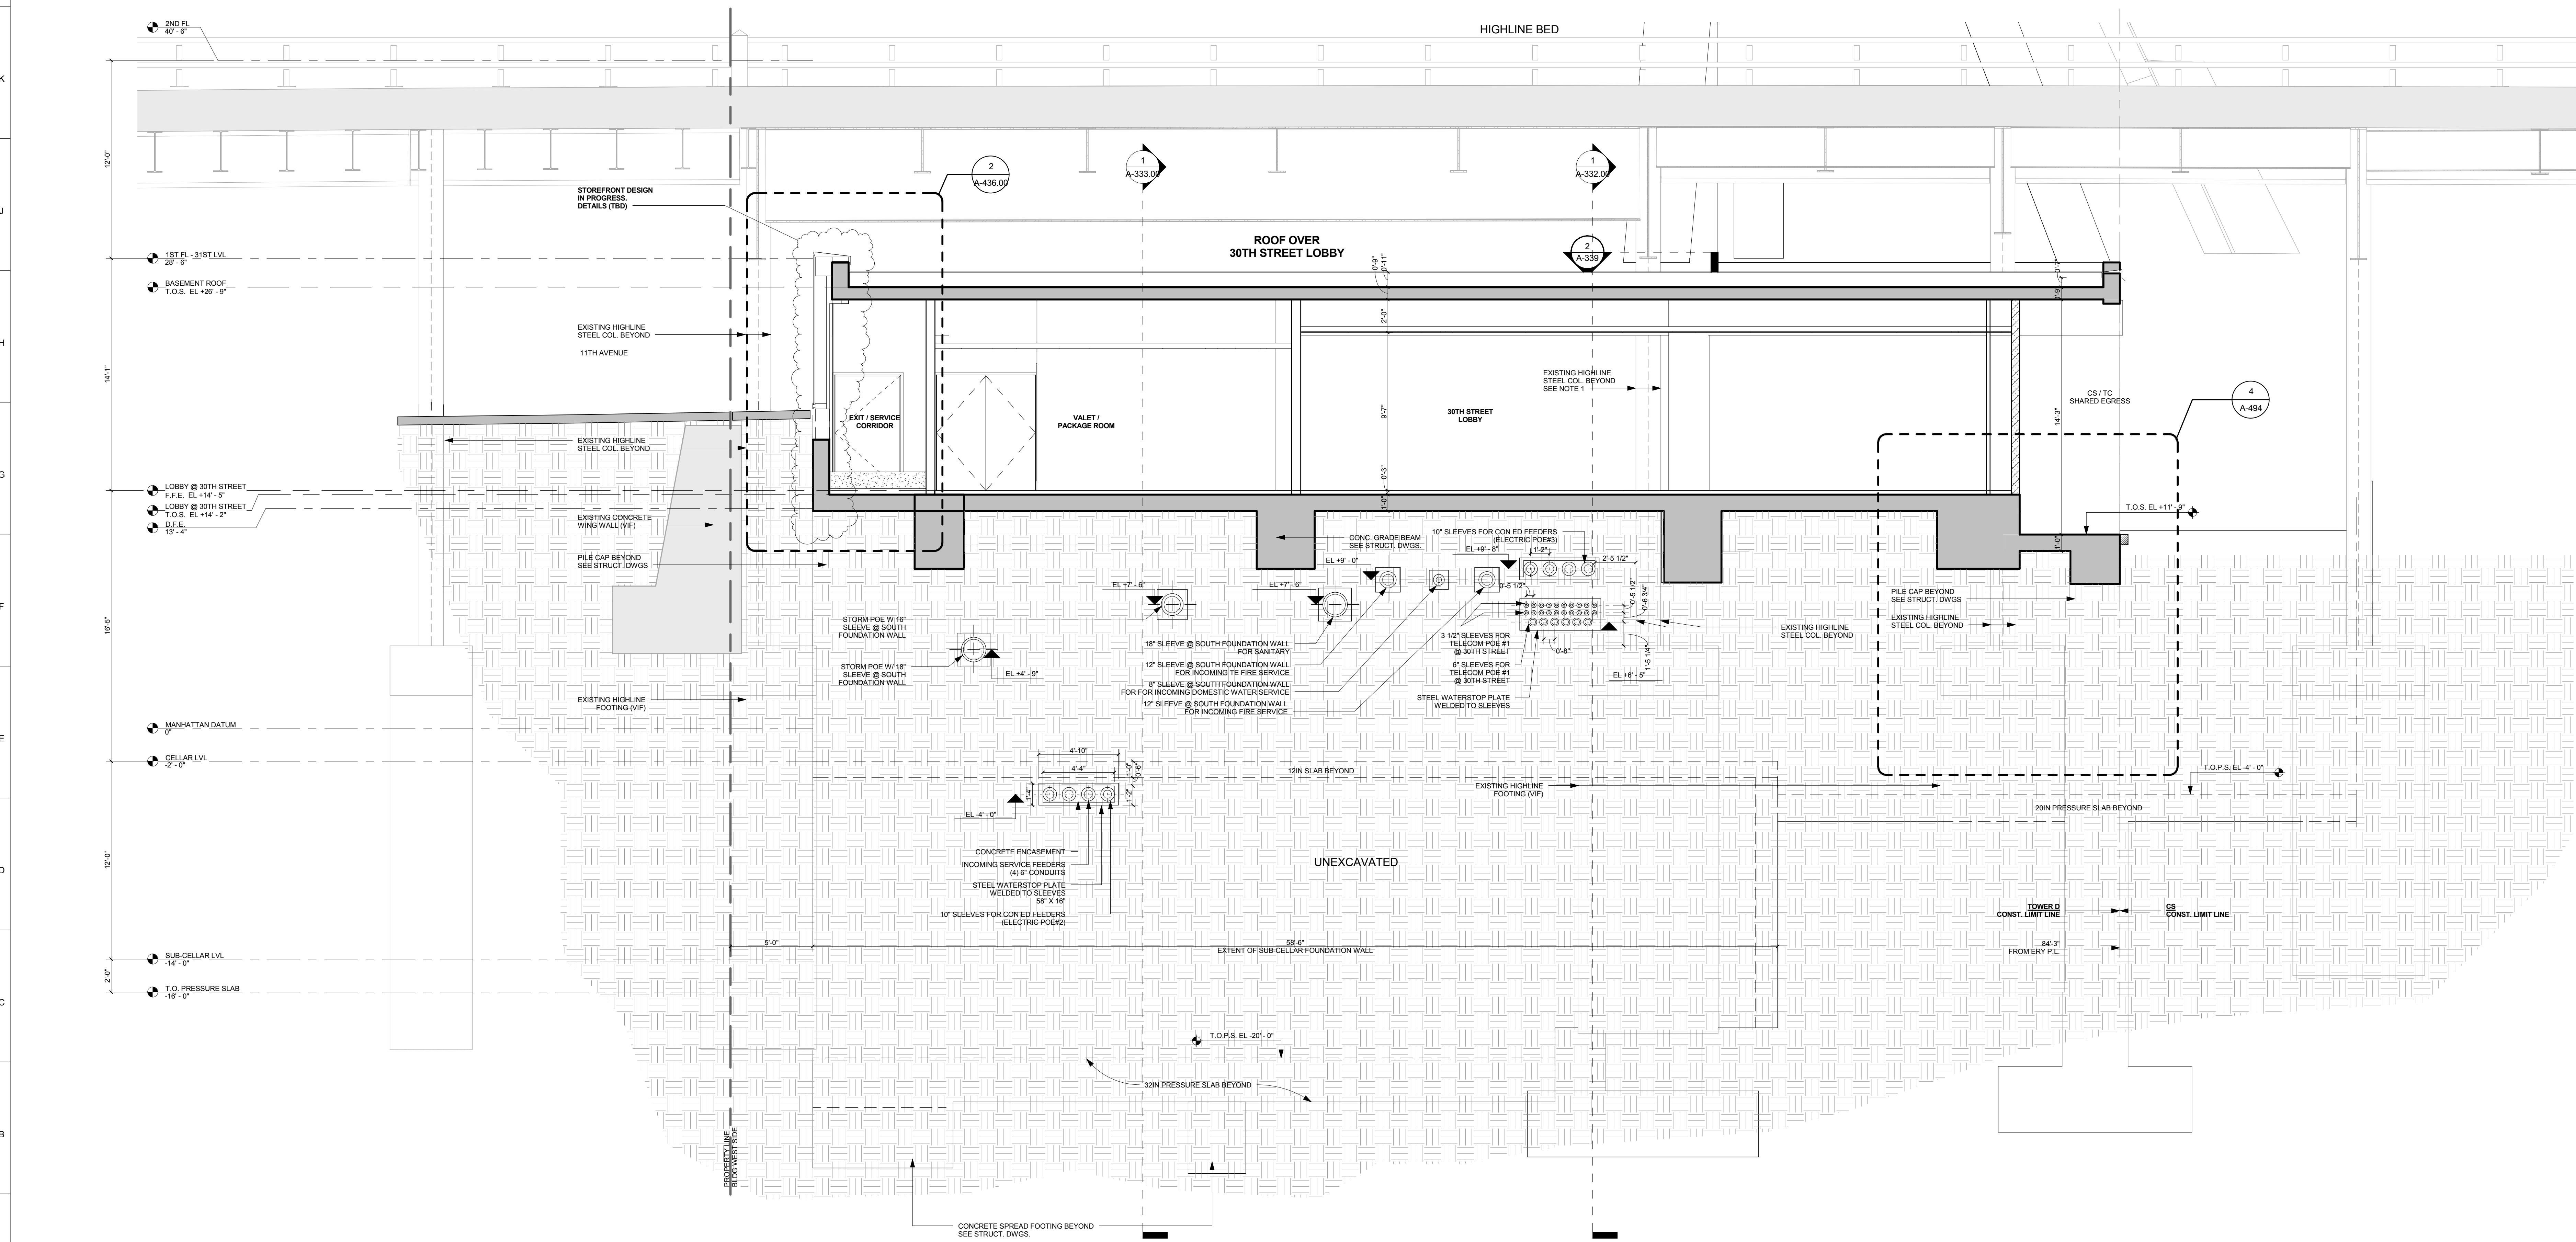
DETAIL SECTION THROUGH HL COLUMN WEB @ 30TH ST. LOBBY ROOF
